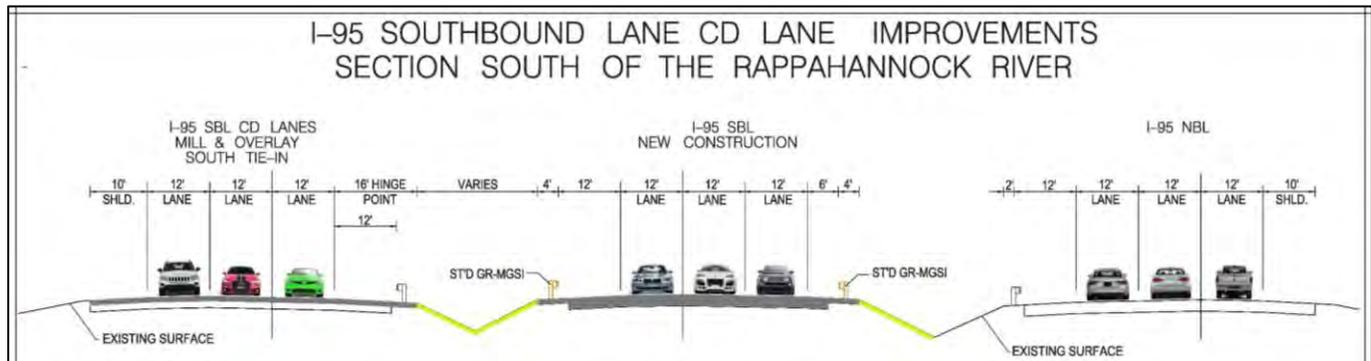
Proposed Typical Section south of the Rappahannock River
